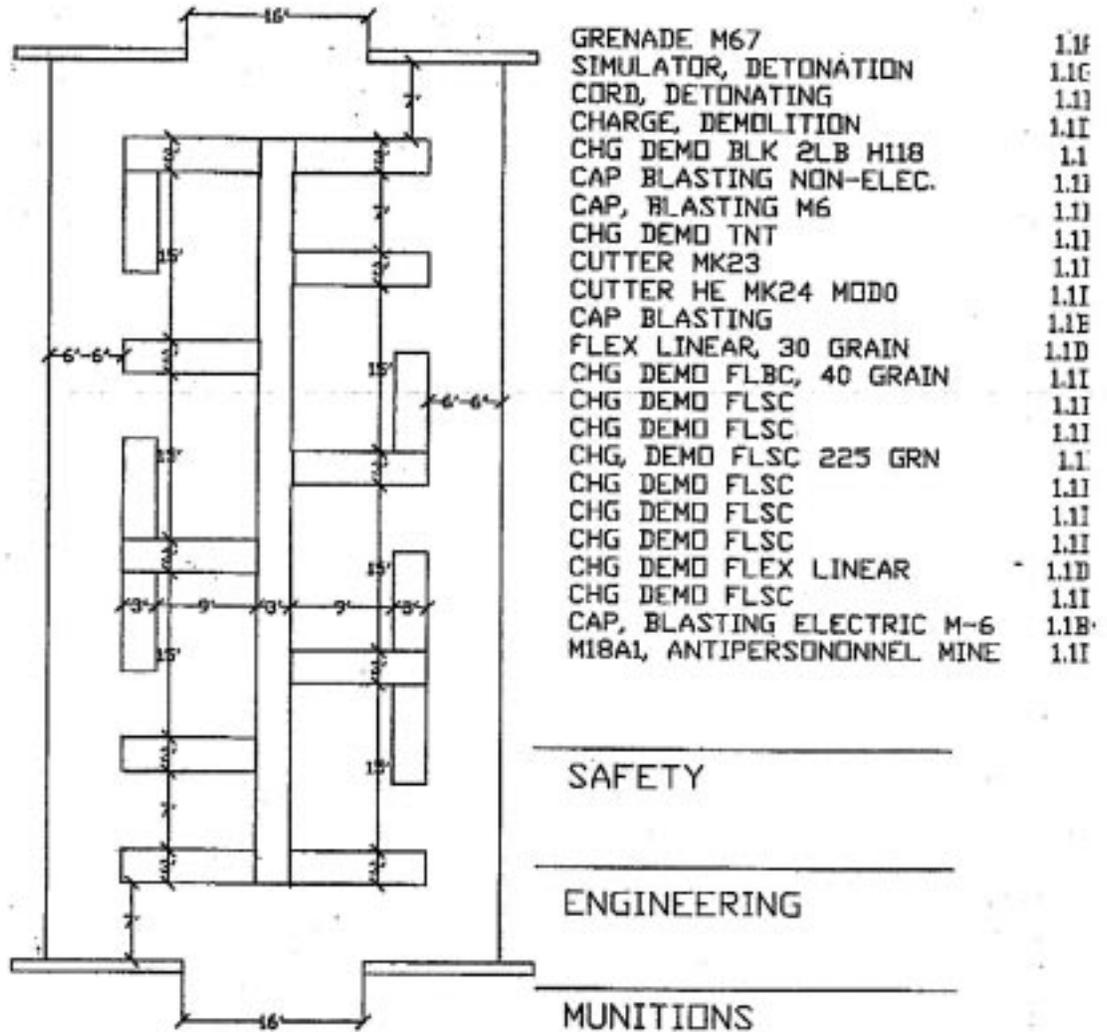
PLAN VIEW OF CELL WALLS IN IGLOO MAGAZINE
